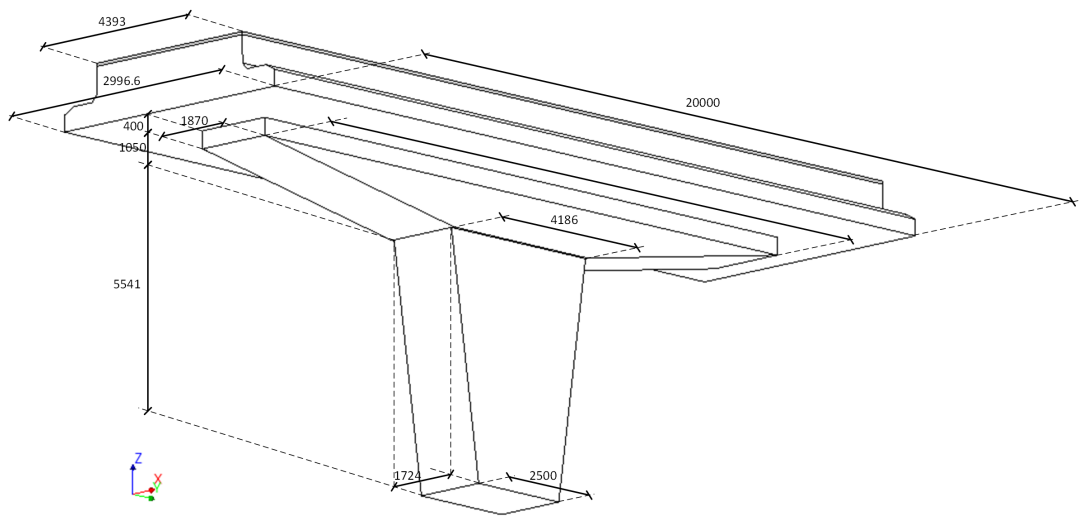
Dimensions of the geometrical components of the 3D solid element model of one support
